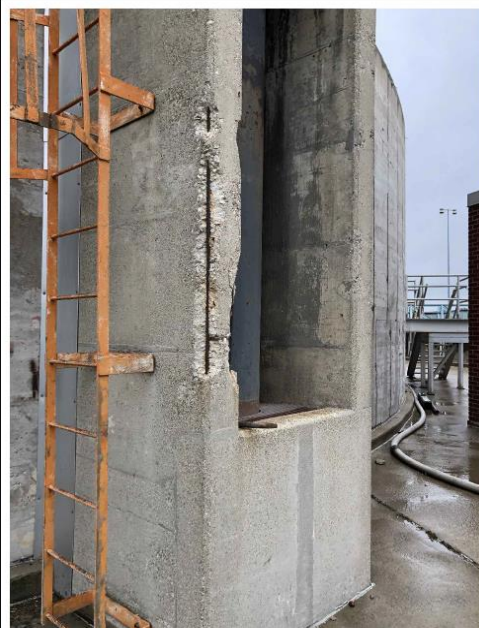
STT-1 DEEP CONCRETE SPALL
